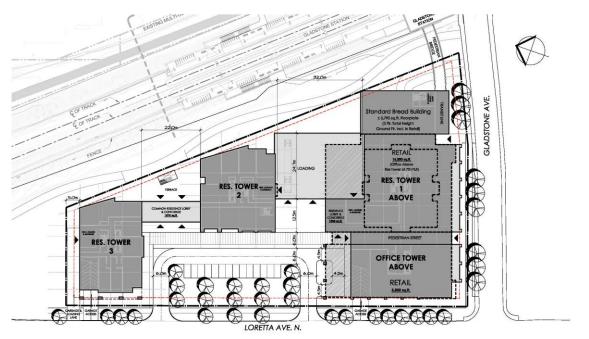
Site plan of the proposed development illustrating its relationship to Gladstone and Loretta Avenues. A future O-Train Station with an elevated pedestrian link to the Standard Bread building is being proposed. Source: Hobin Architecture 2018.
